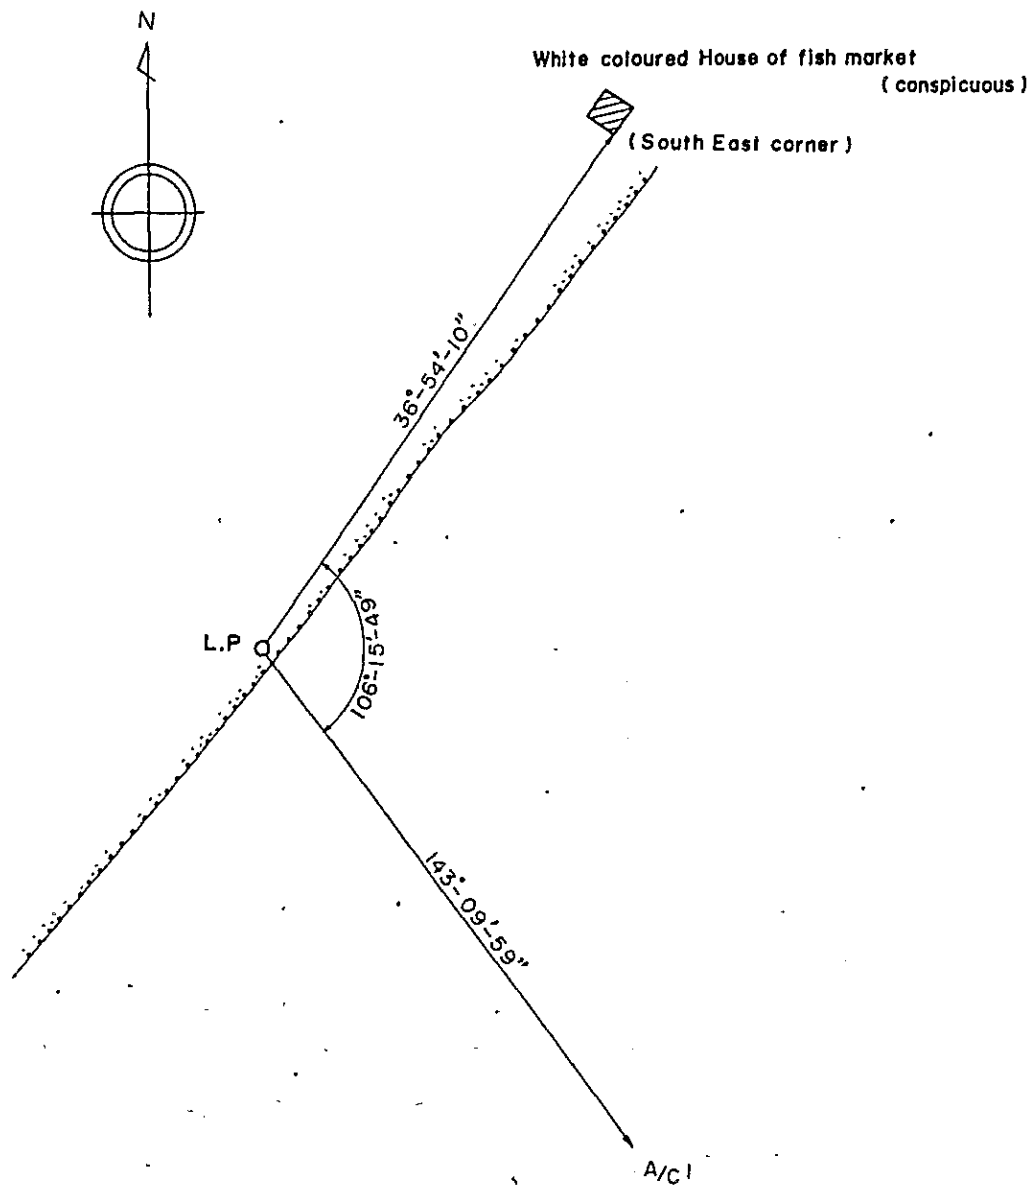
(b) BEARINGS OF CABLE ROUTE IN KUANTAN
